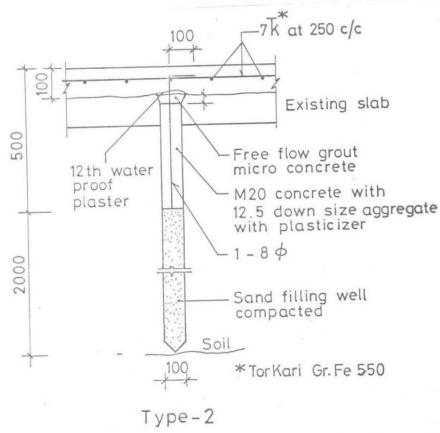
Details of sand piling along with the concrete pile with the projecting reinforcement.
